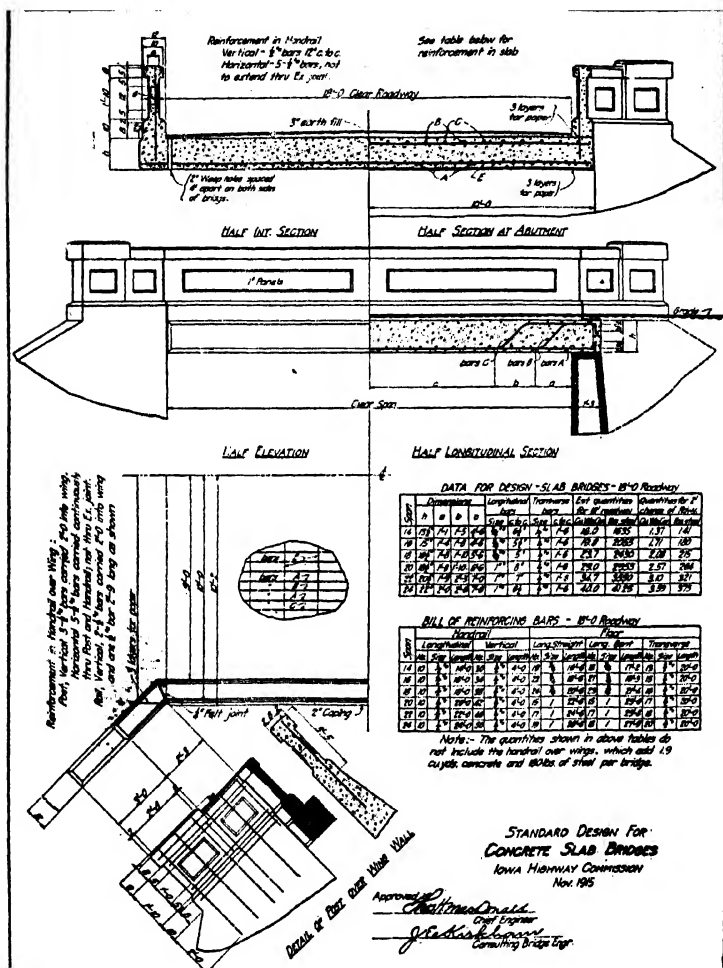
Reinforced concrete slab bridge of the Iowa Highway Commission.
